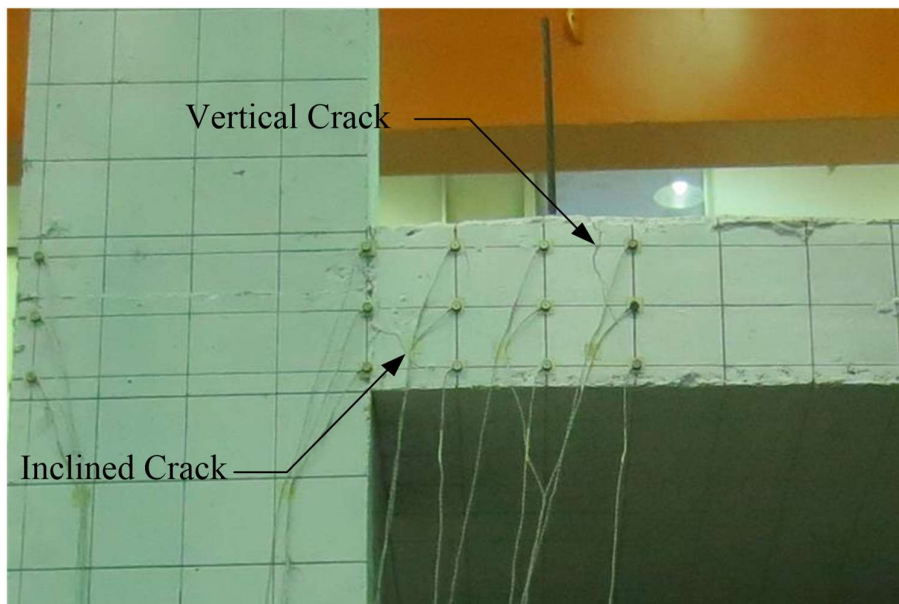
Crack Pattern on the West Face of the Slab of Specimen G3 at 0.25% Drift
